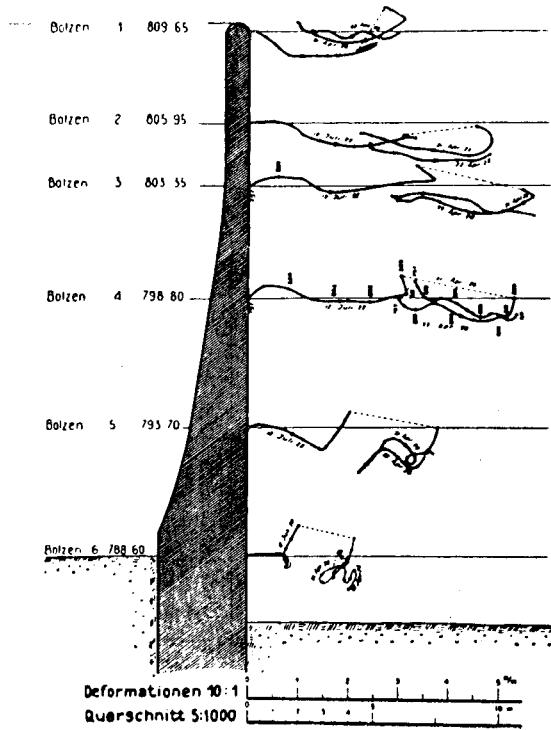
Movement of dam at Pfaffensprung in Switzerland.
